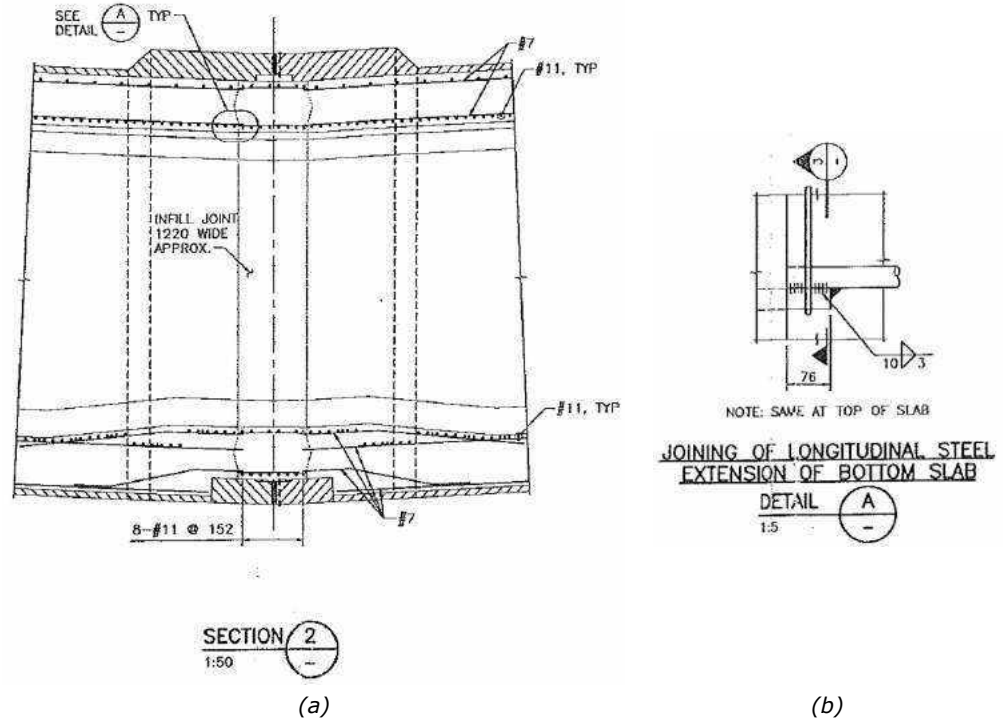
(a) Reinforcement detailing at the infill joint with (b) weld detail utilized at the joint.
